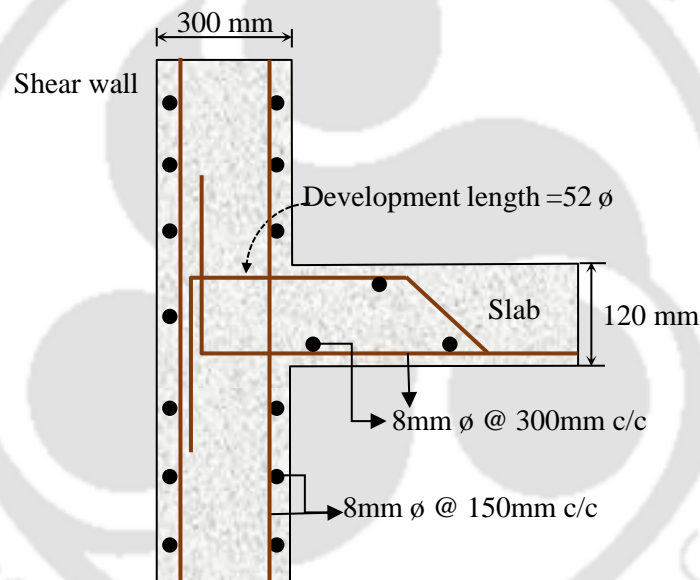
Detailing of reinforcement at shear wall - slab junction.
